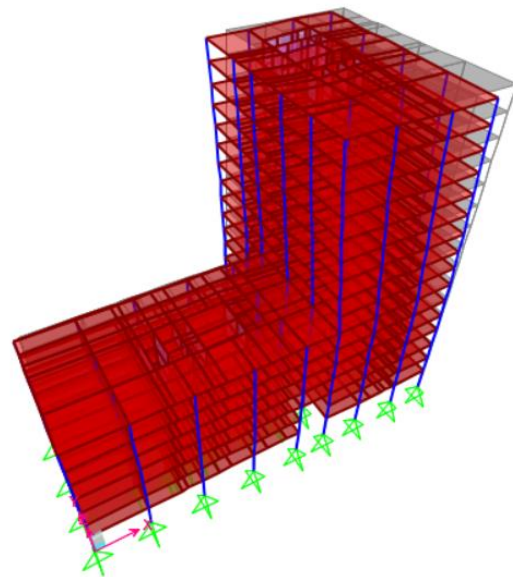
Mode shape 2 (x-direction) for the shear wall structure
